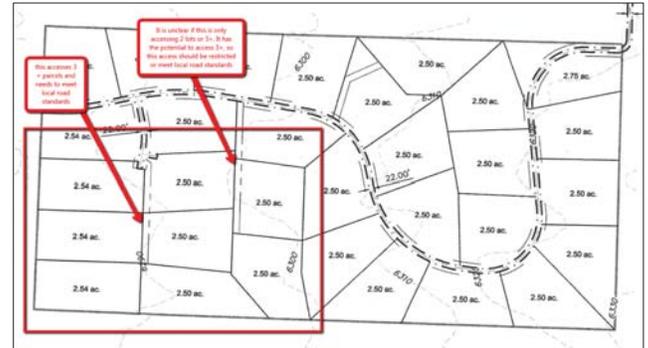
South parcel - Driveways that must meet local road standards or could be required to meet local road standards
